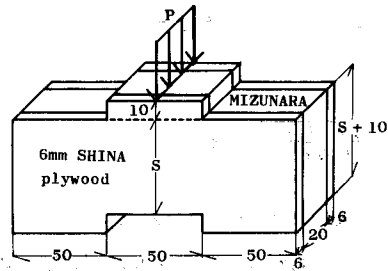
Panel shear test specimen of plywood gusset. (unit: mm)
